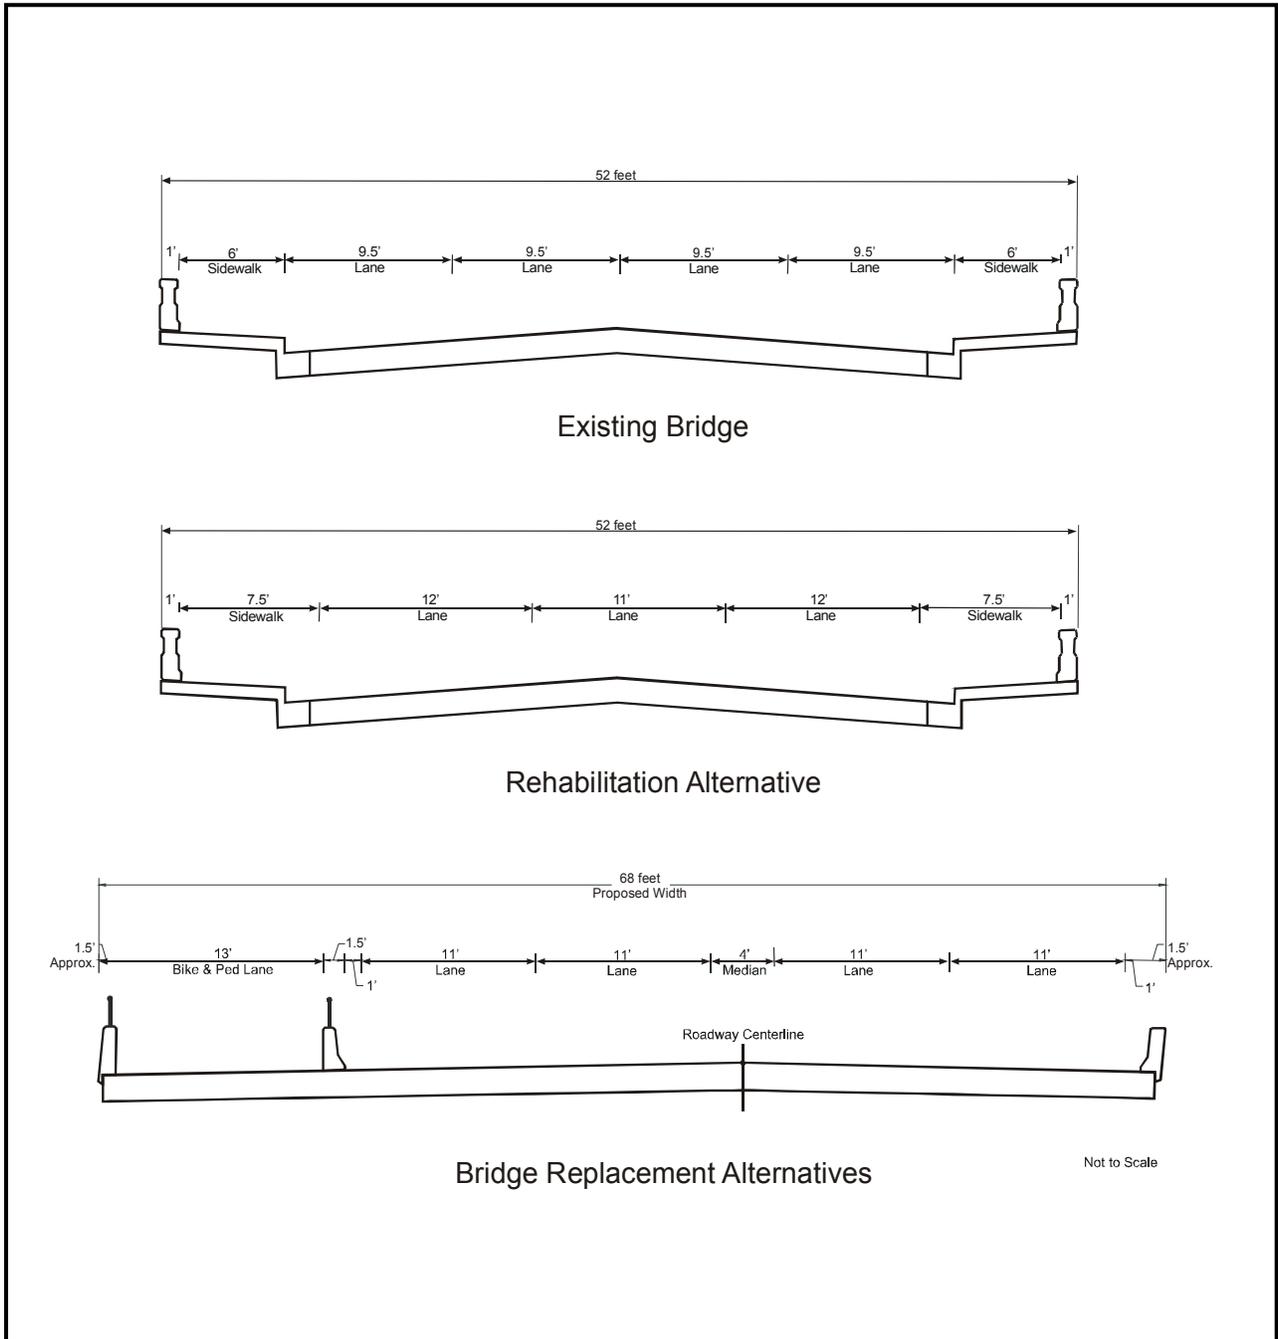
Existing and Proposed Bridge Cross-Section Designs
